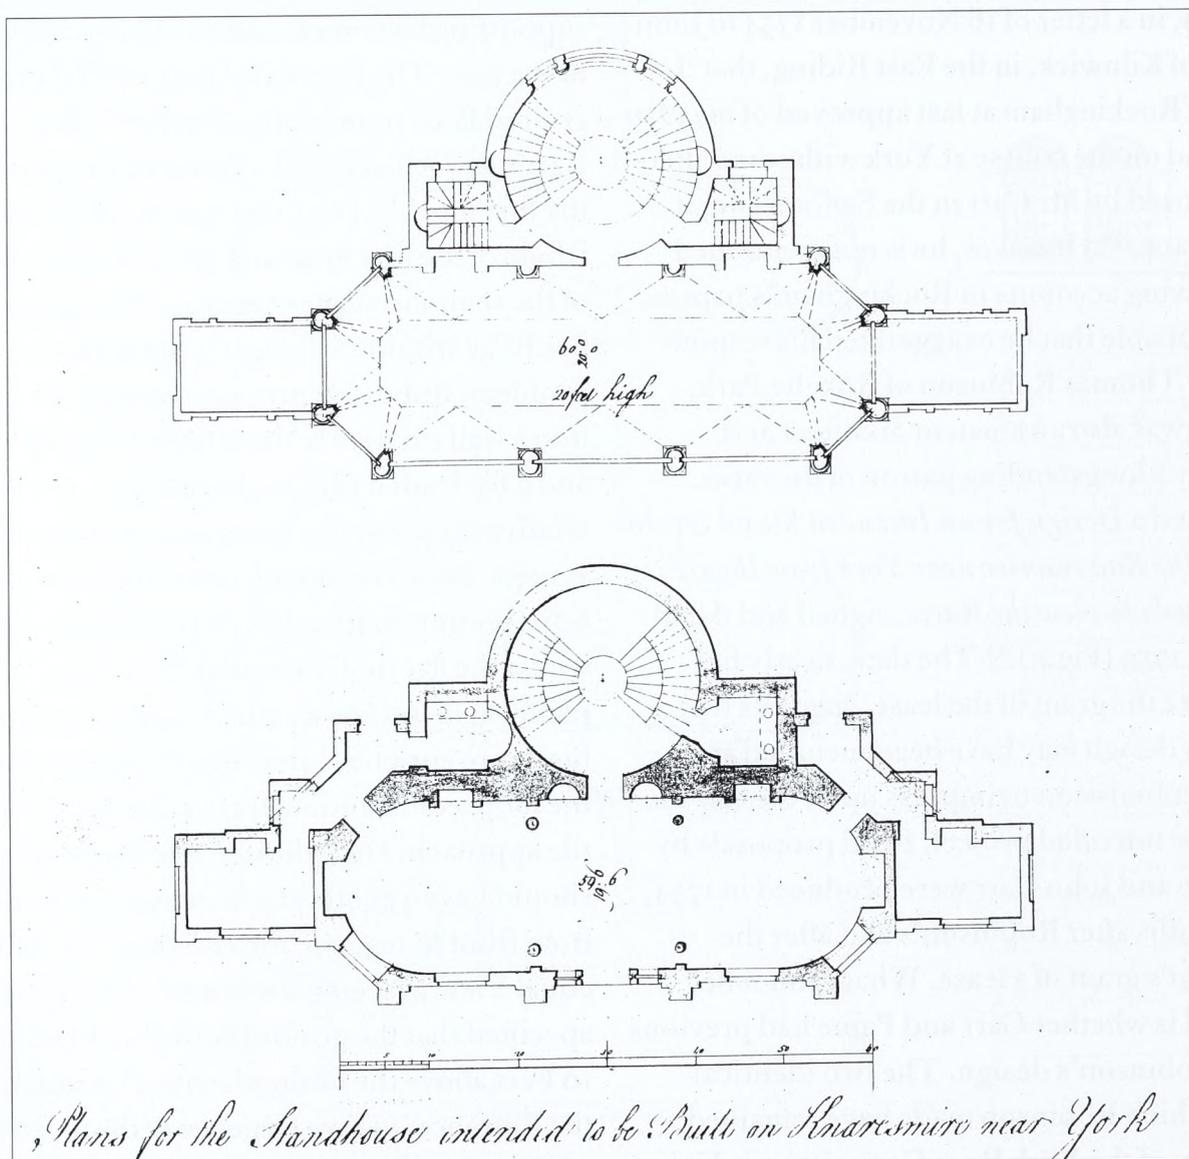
James Paine, Proposed ground and first floor plans for the Knavesmire stand, 1754 (first scheme). *Sheffield Archives.
